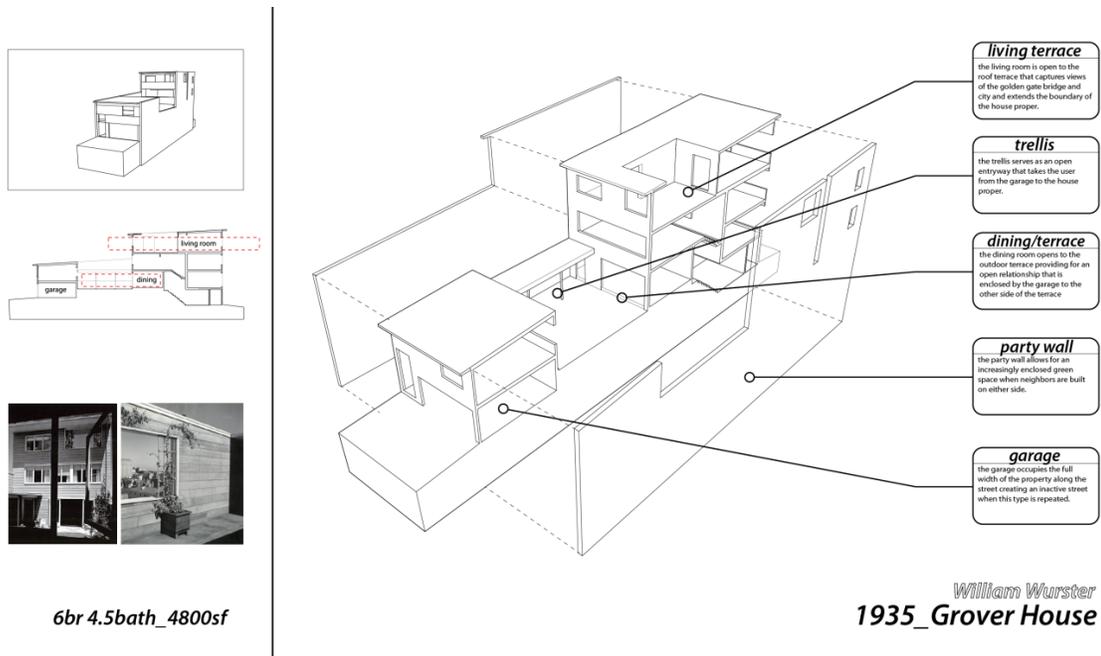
William Wurster's San Francisco Grover House (source: Author)
